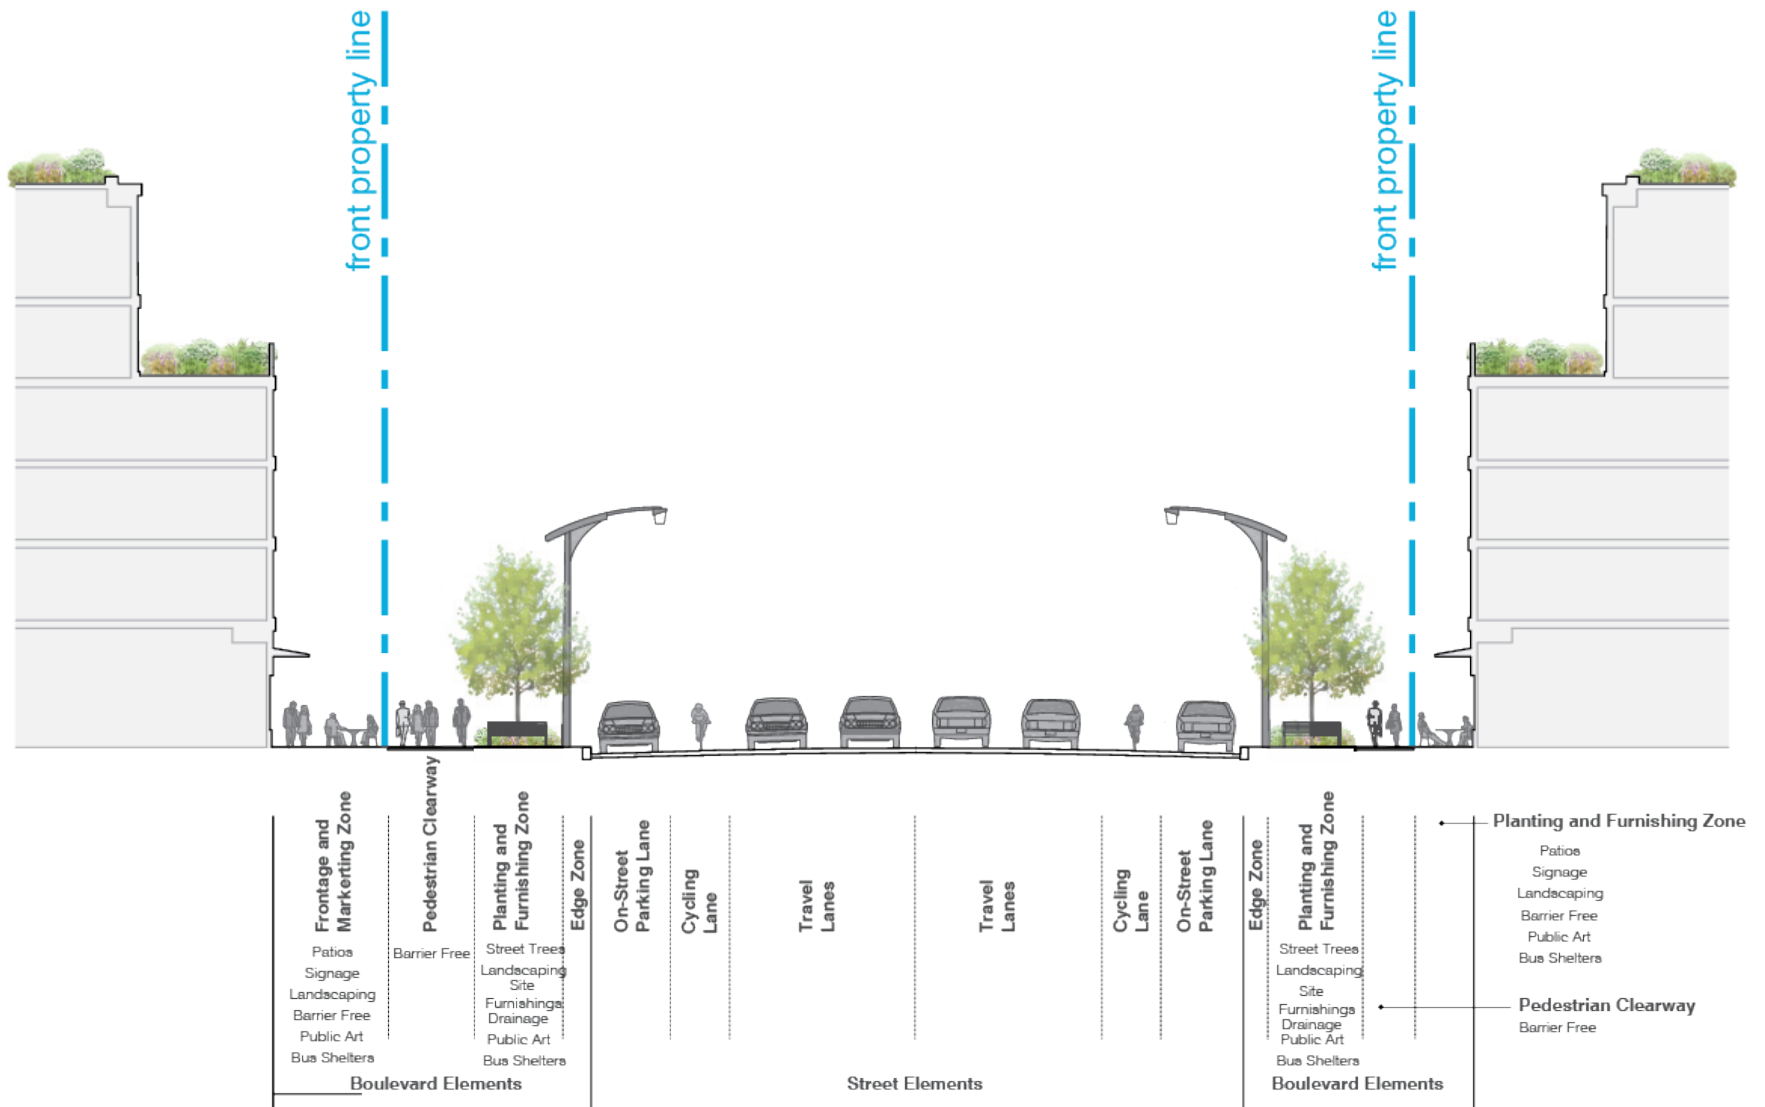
Example of typical street and boulevard elements within general right-of-way.
